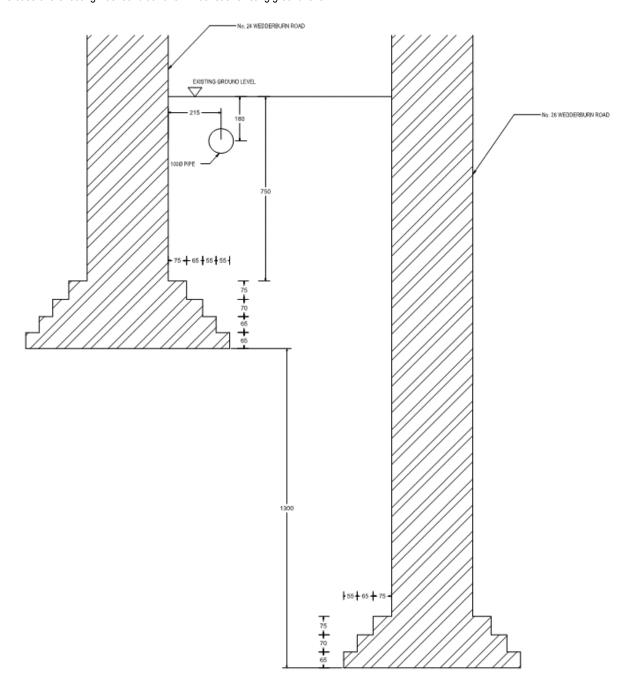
SECTION SHOWING FOOTING TO No. 24 WEDDERBURN ROAD ADJACENT TO BASEMENT FOOTING OF No. 26 WEDDERBURN ROAD.
